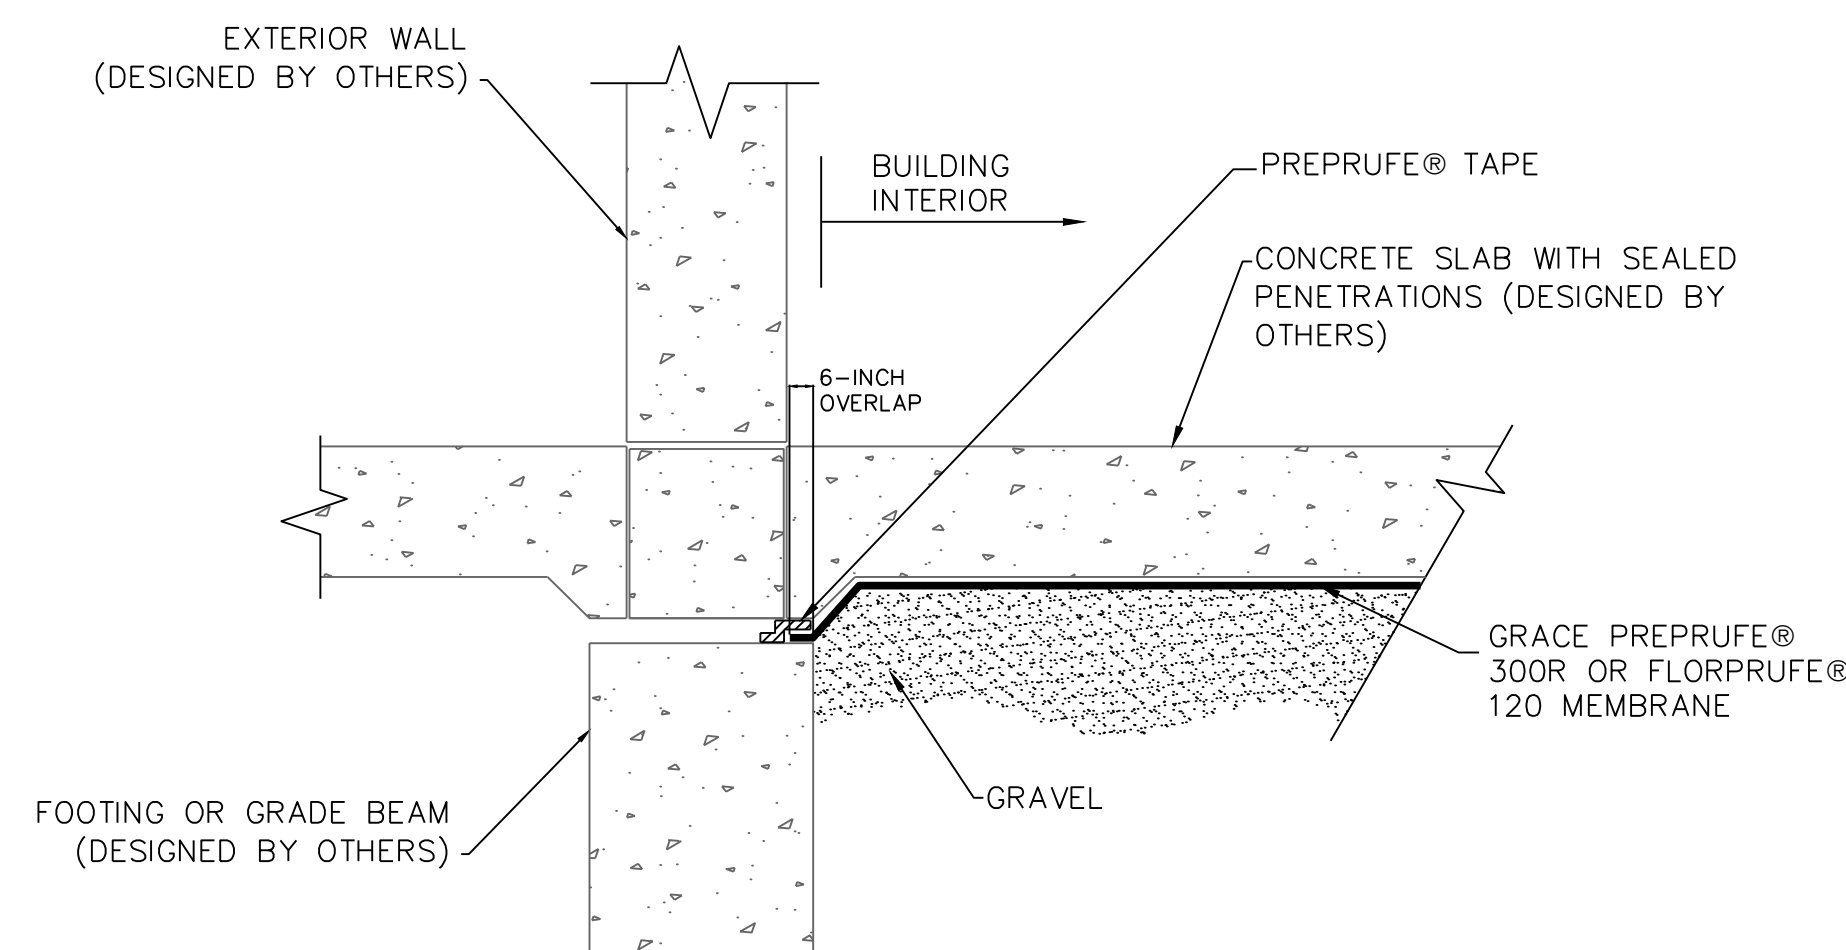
TYPICAL VAPOR BARRIER ASSEMBLY AT INSIDE CORNER
